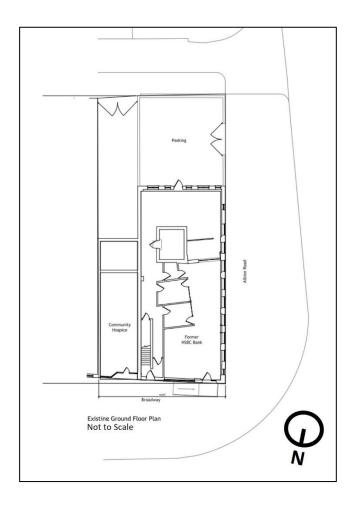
Existing Ground Floor Layout Plan (extract mab Architecture drawing A-100B)
